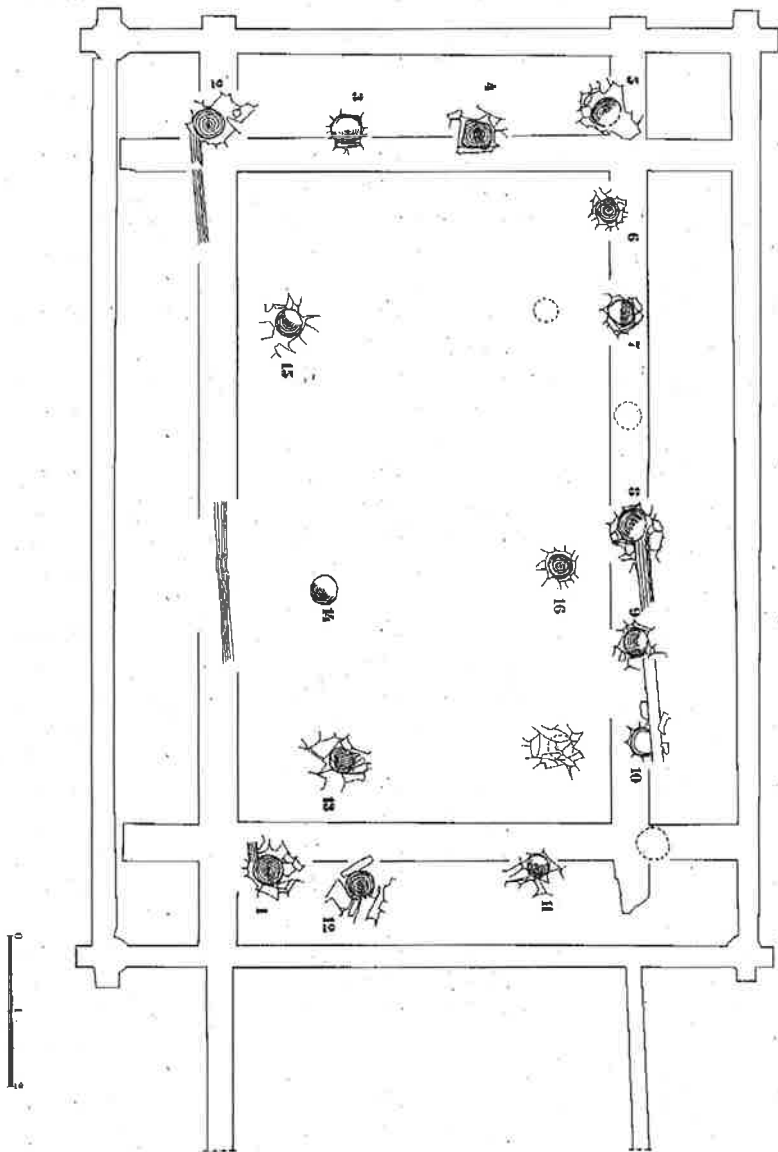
Plan over Lom I (Håkon Christie 1973)
